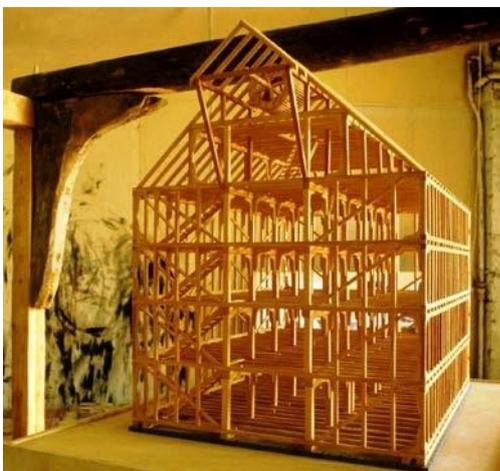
Warehouse in Kristiansund for salting and storage of klippfish. The open timber frame construction was simple and quick to construct.
